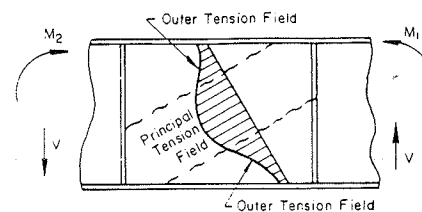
Typical transversely stiffened plate-girder web-plate panel under combined moment and shear.
